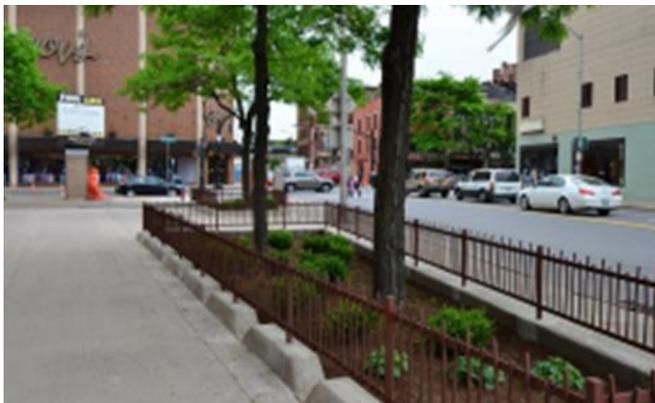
Stormwater Planter, Hawley Street, Binghamton (Source: Binghamton Stormwater Planter Brochure)
